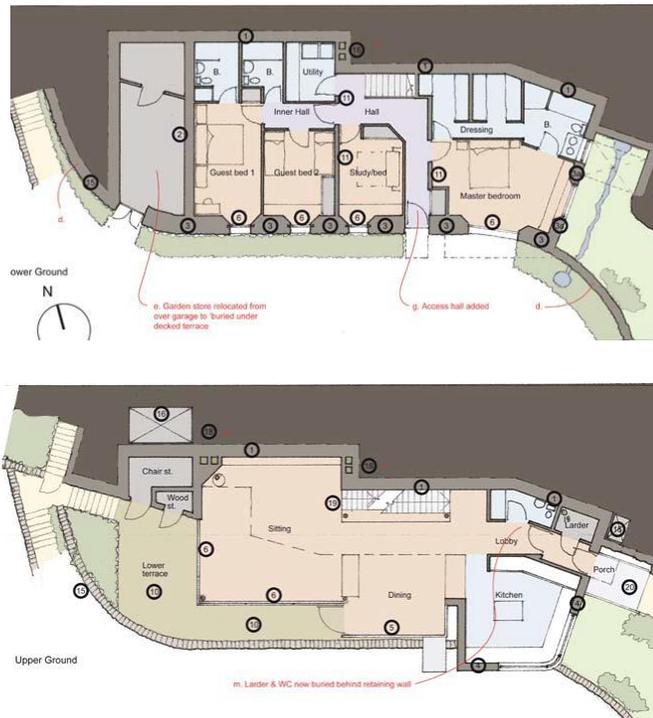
(a) Lower Ground Floor ; (b) Upper Ground Floor
